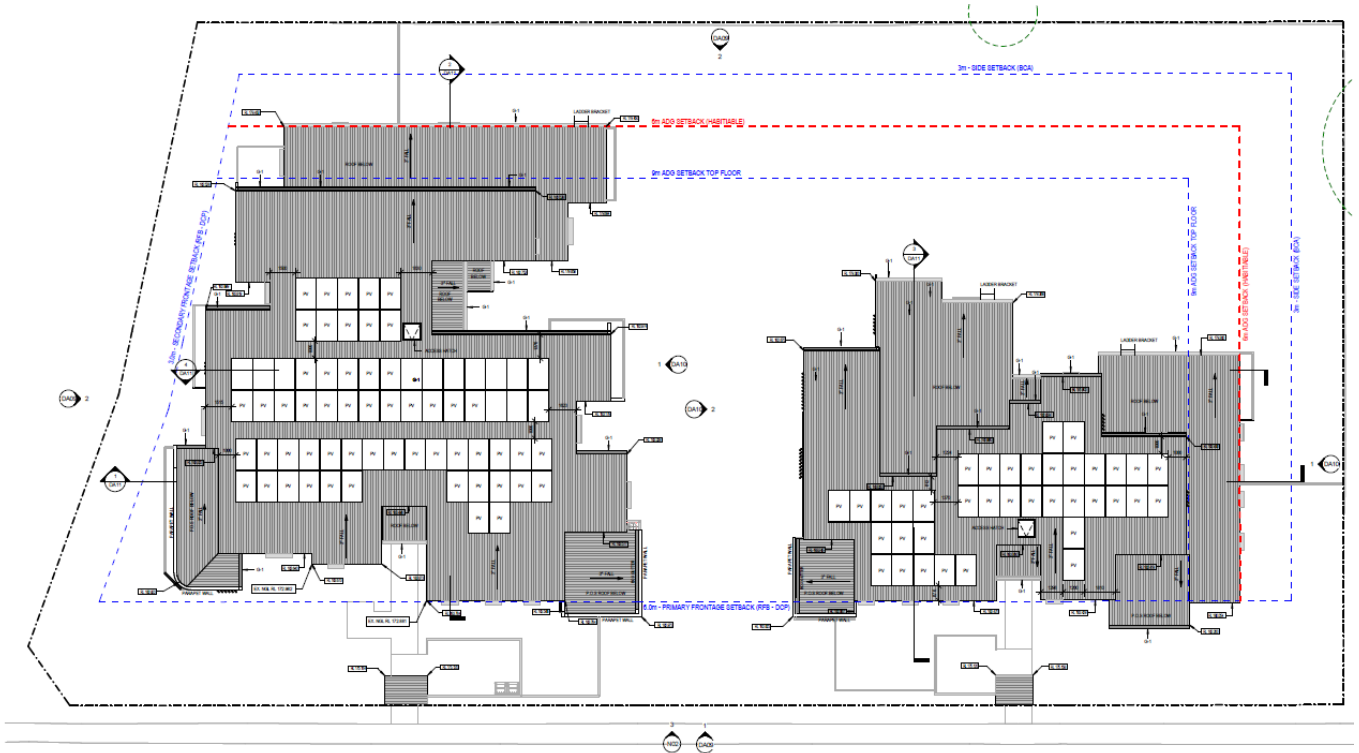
Extract from Architectural Plans – Roof Plan (Source: Architectural Plans, Brewster Murray Pty Ltd, dated 7/02/2025)
